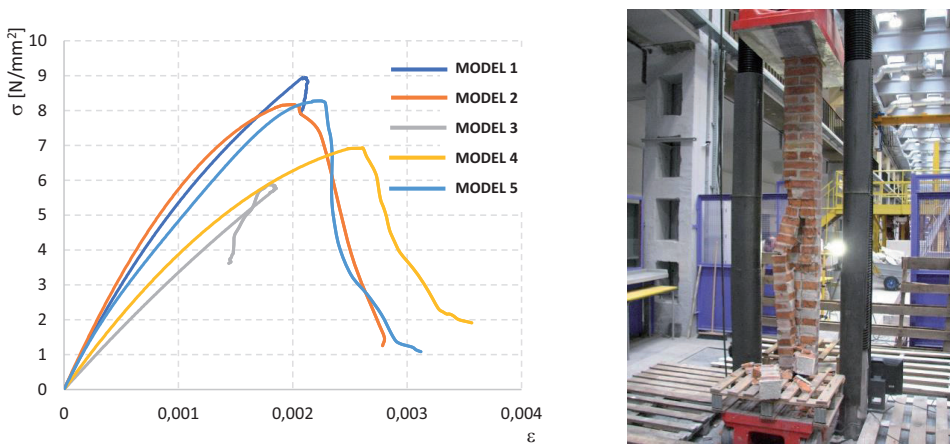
Relationship stress – strain during compression of solid brick columns under uniform load and damaged column model
